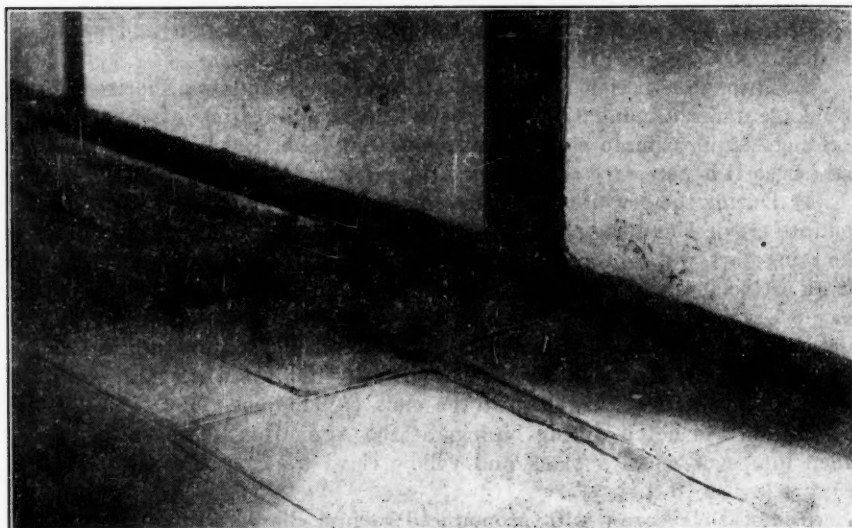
STONE OR CONCRETE FLOORS APPEAR TO SETTLE CONSIDERABLY
